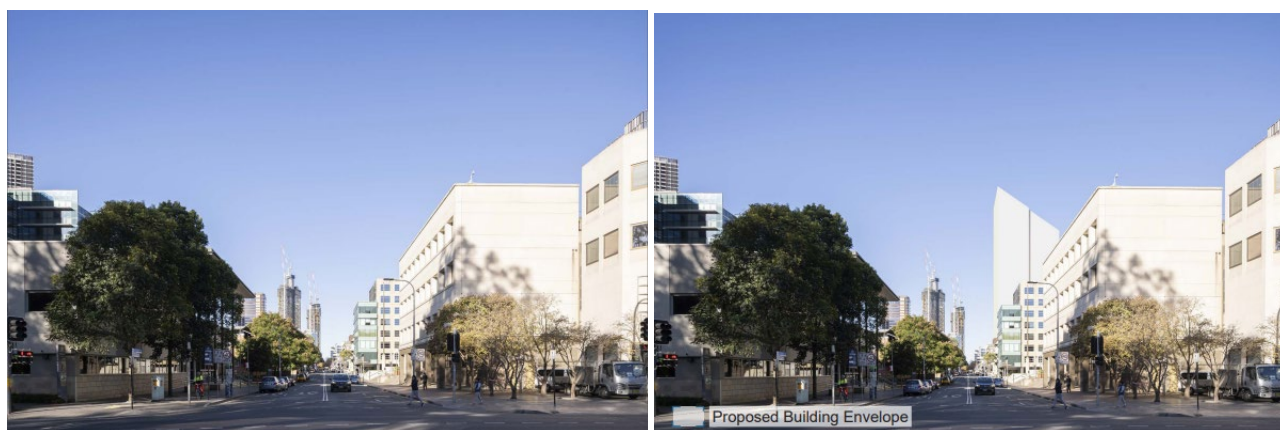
Viewpoint 08: Existing (left) and with proposed building envelope (right)
